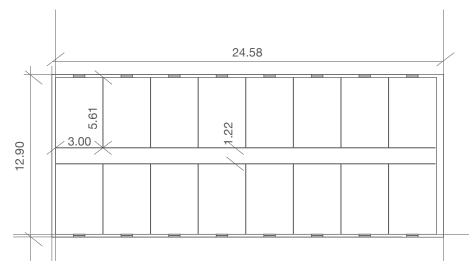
Plan view of a 400 place finisher model on which lighting suppliers based their quotes. Measurements are listed as metres (m)
